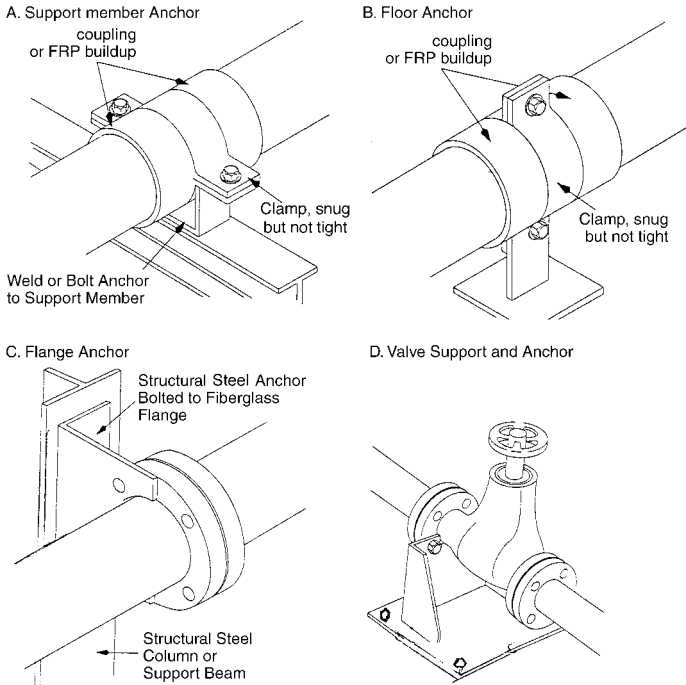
Typical anchor details. Pipe is restrained in all directions. (Courtesy of Fibercast Co.)
